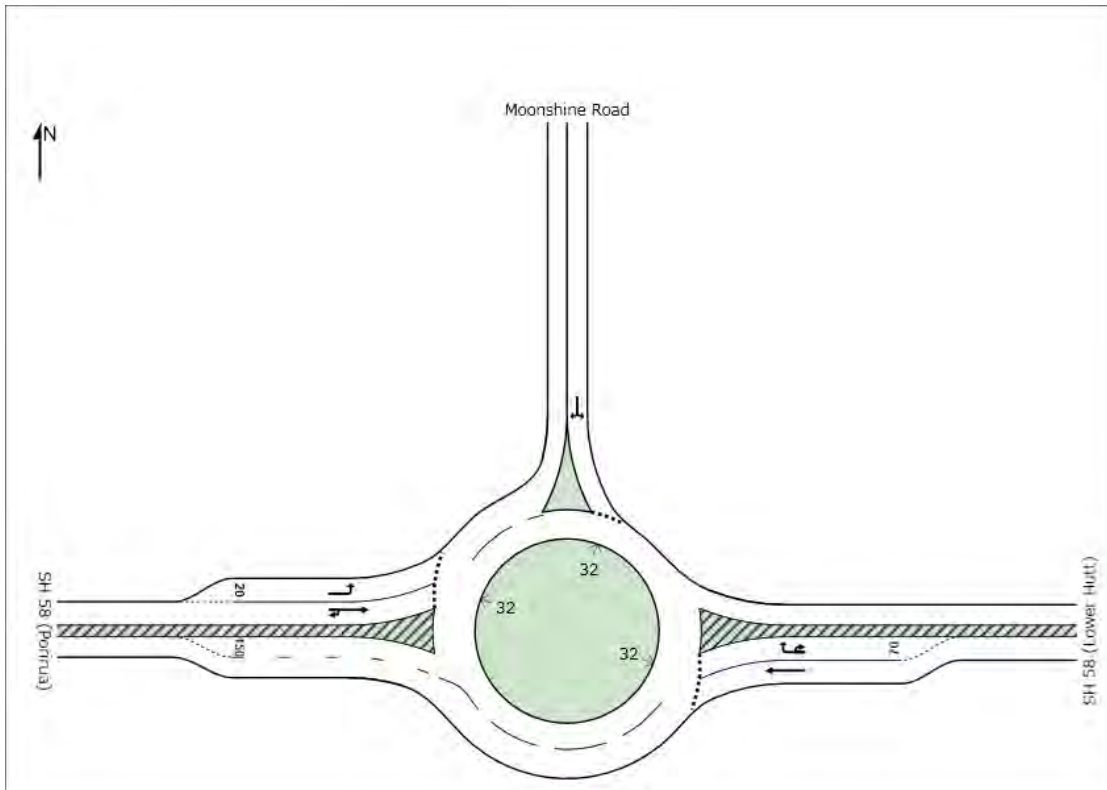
Moonshine Road Roundabout Layout (Option 4)
